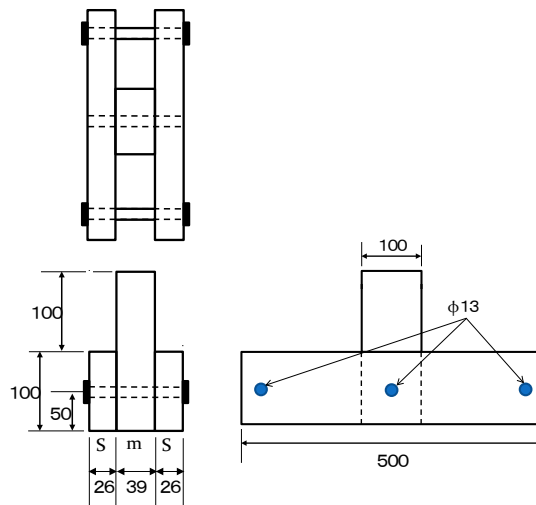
Specimen for double shear test, loading direction perpendicular to the grain of side member.
